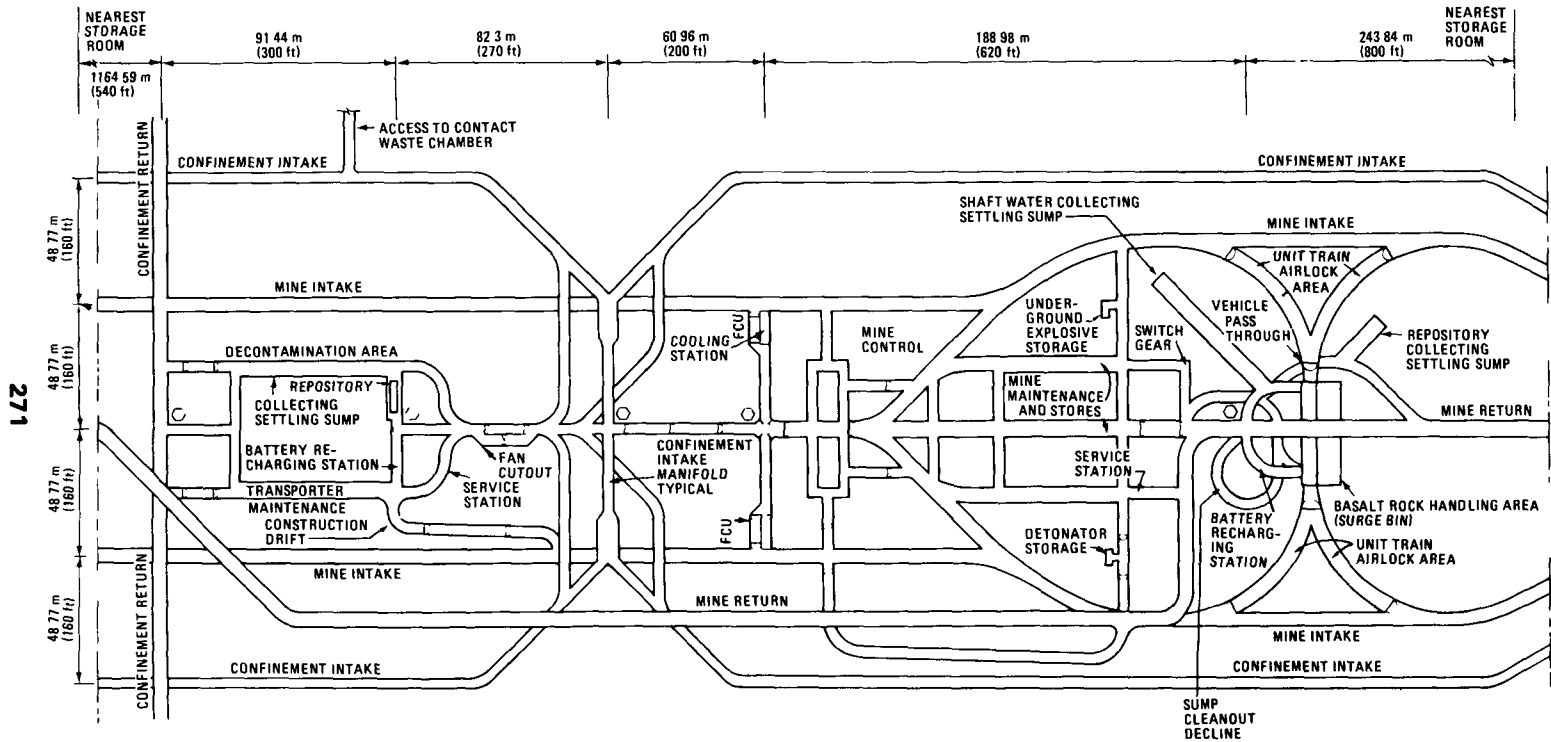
Shaft pillar layout. 8, fan; D, airlock door.
